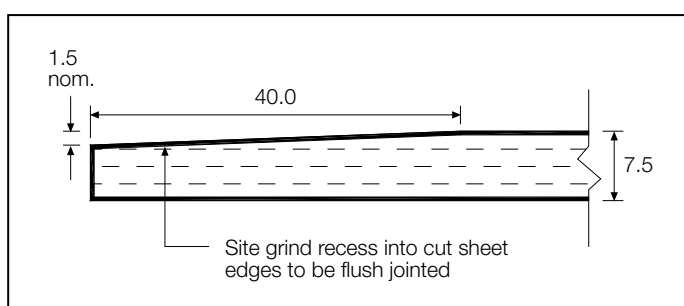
SITE GROUND RECESSED EDGE DETAIL
